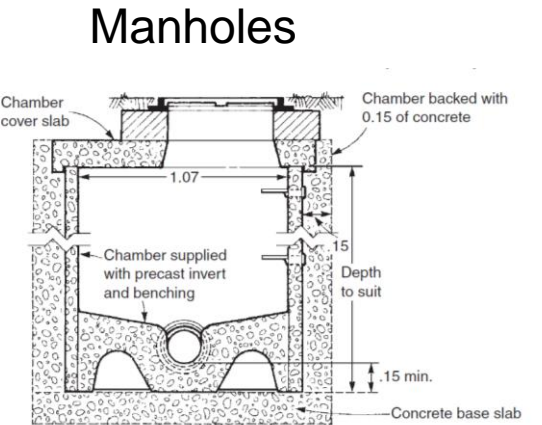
Precast concrete ring manhole (reproduced from Woolley 1988 with permission of E & FN Spon)
